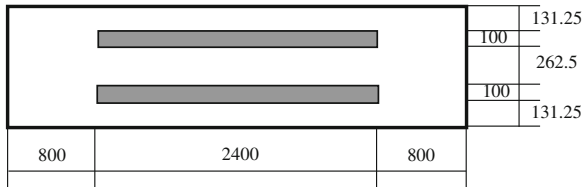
Setting of FRP PLATES at the soffit of the beam (plan-view, dimension in mm)
